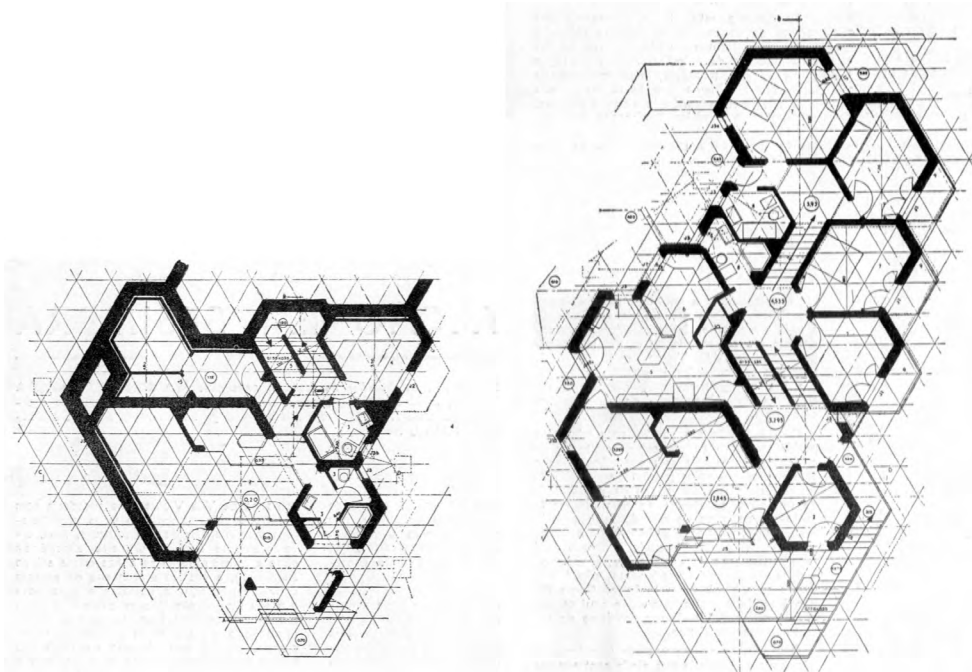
House in Sesimbra. Plans of the ground floor (left) and upper levels (right)
